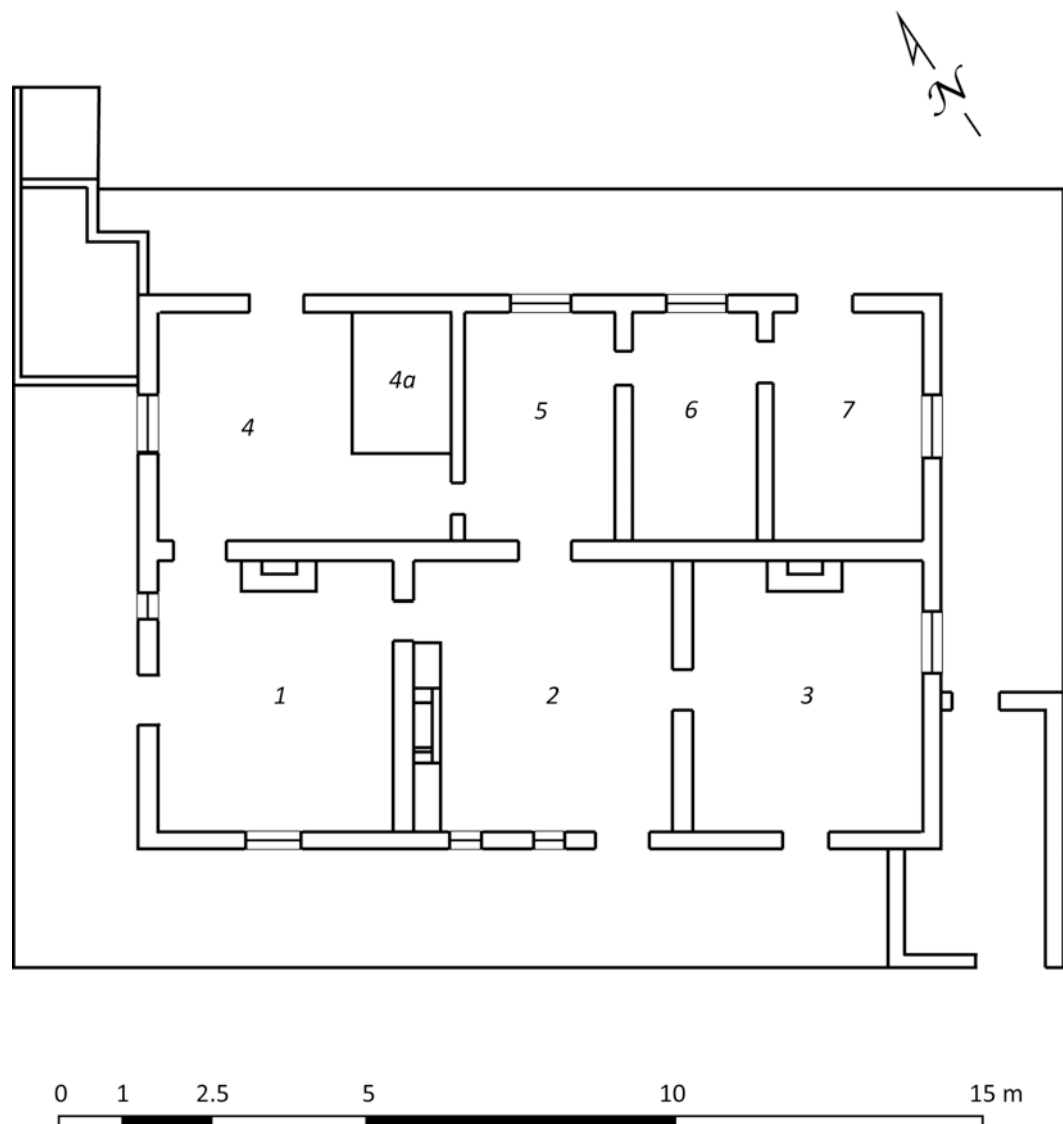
Plan of House. Rooms 1, 2 and 3 and thought to be the original core of the house built by Henry de Burgh (F. Bush)
